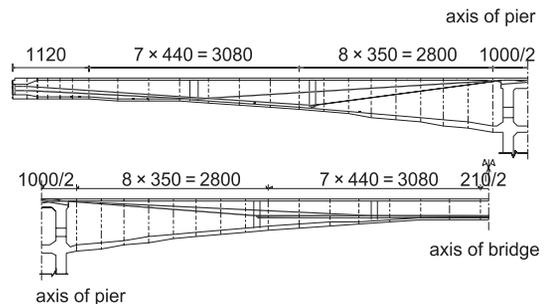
Layout of the external prestressing system in the right-deck bridge, cm
